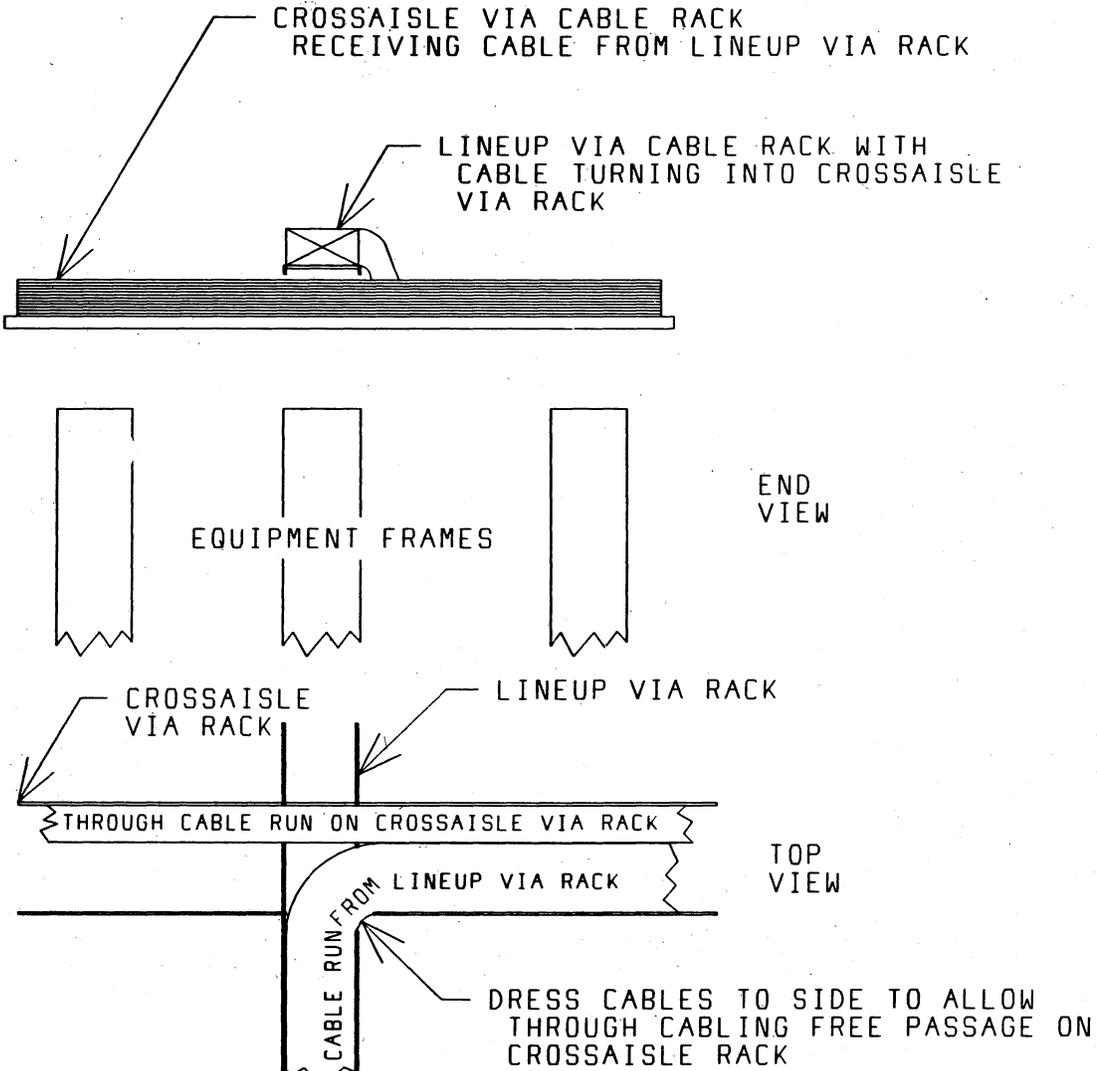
Dressing Cables at Intersections of Cross Aisle and Lineup Via Cable Racks
